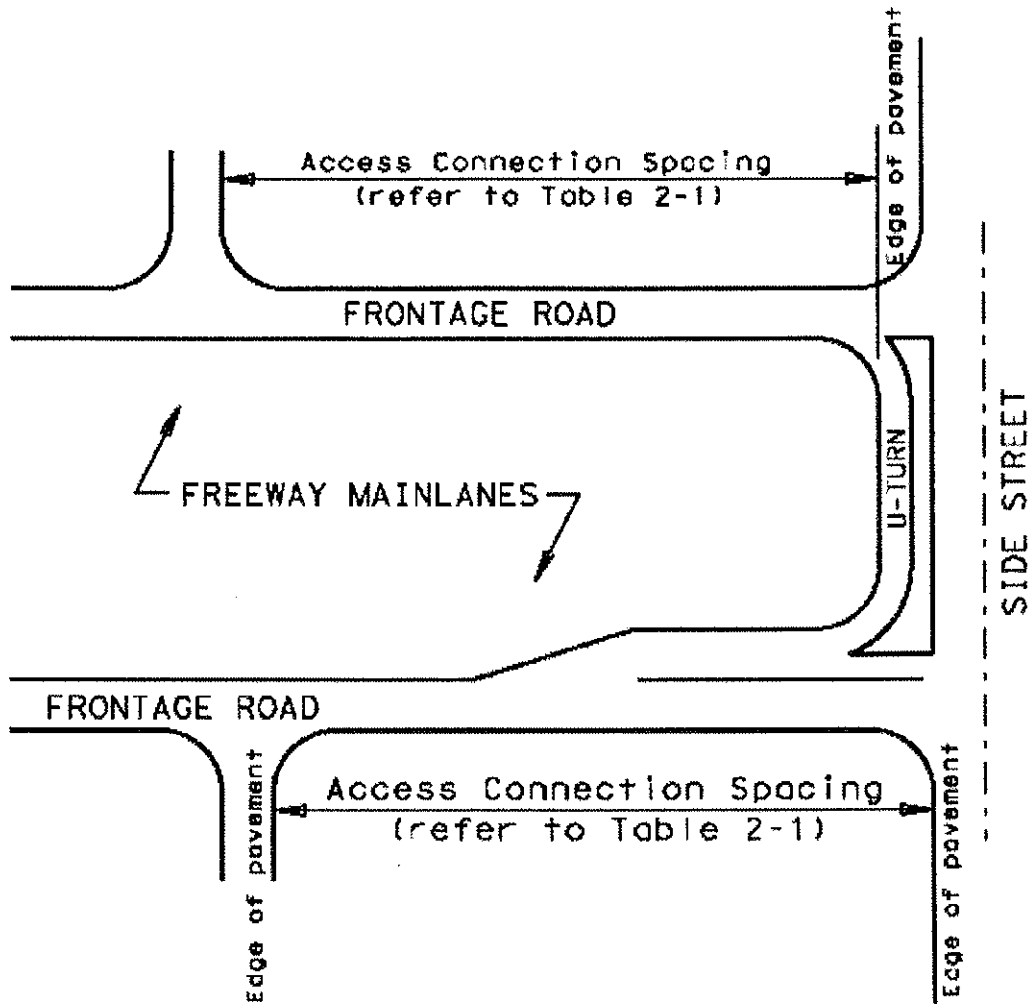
Frontage Road U-Turn Spacing Diagram
